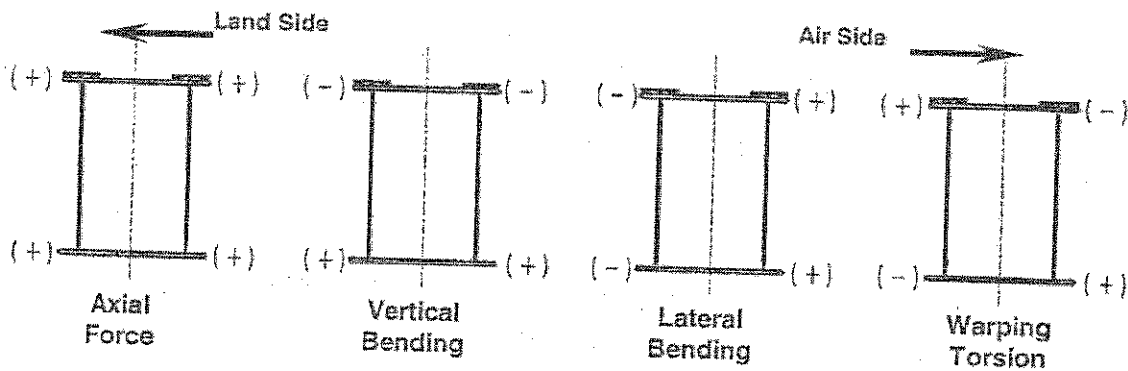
Assumed Positive Sign Convention in Box Girders.
